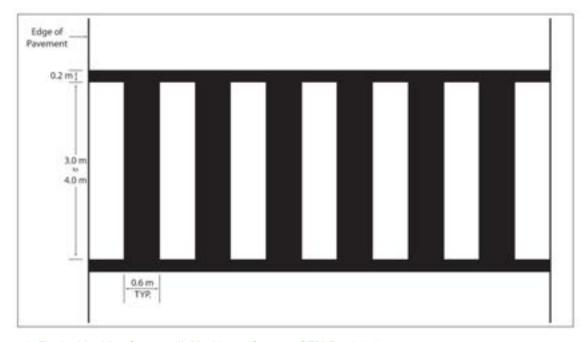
Typical Ladder Crosswalk Markings (Source: OTM Book 15)
